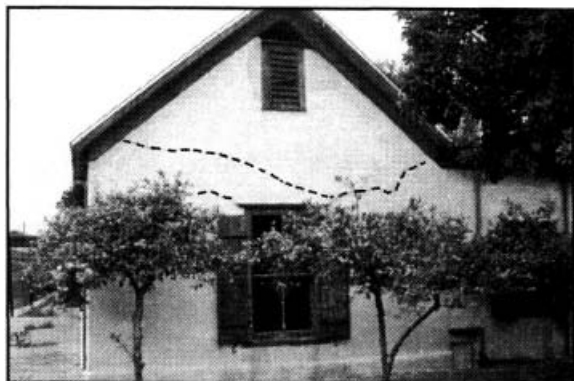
South gable-end wall. Horizontal cracks above window lintel and above ceiling height may define the location of a wood Plate, similar to that seen on the north end.
